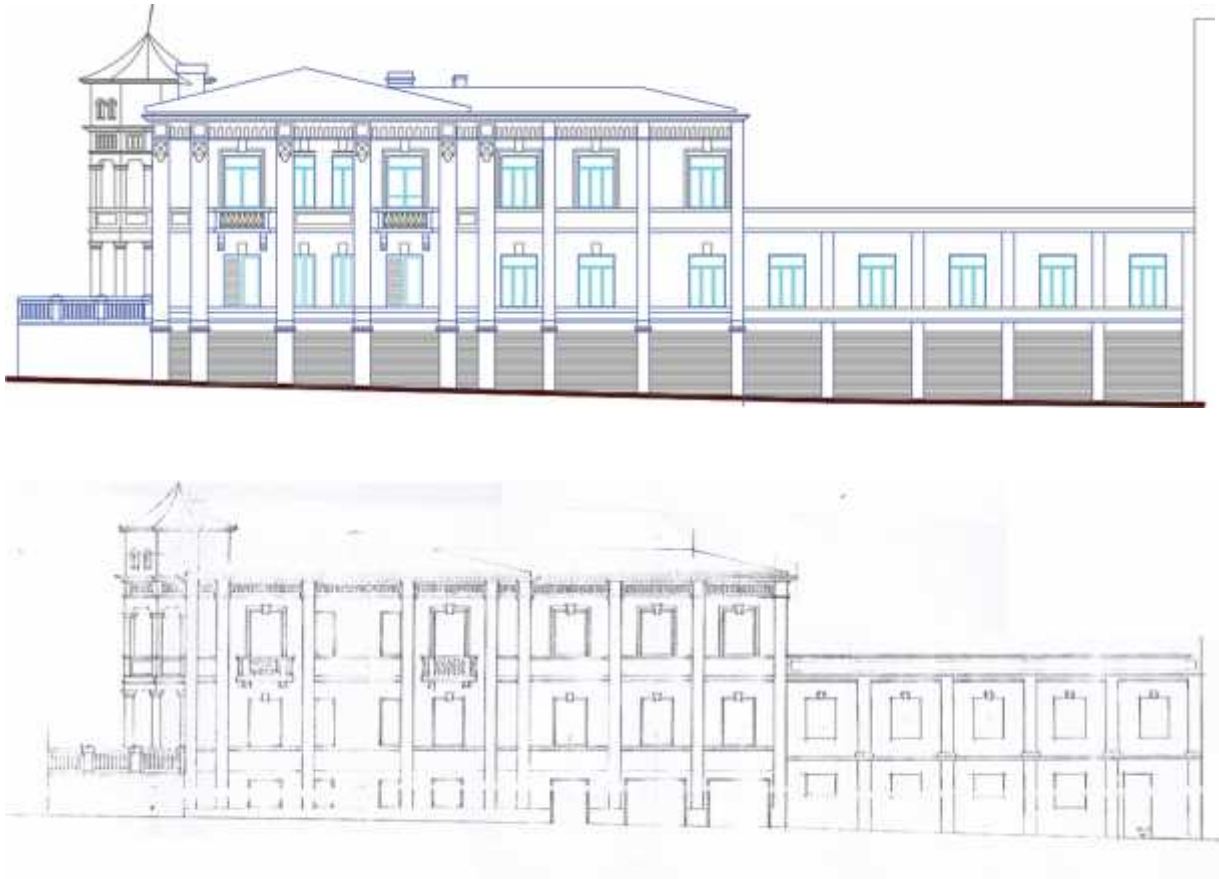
Building Main Façade (a) Today survey (b) Original Plan
